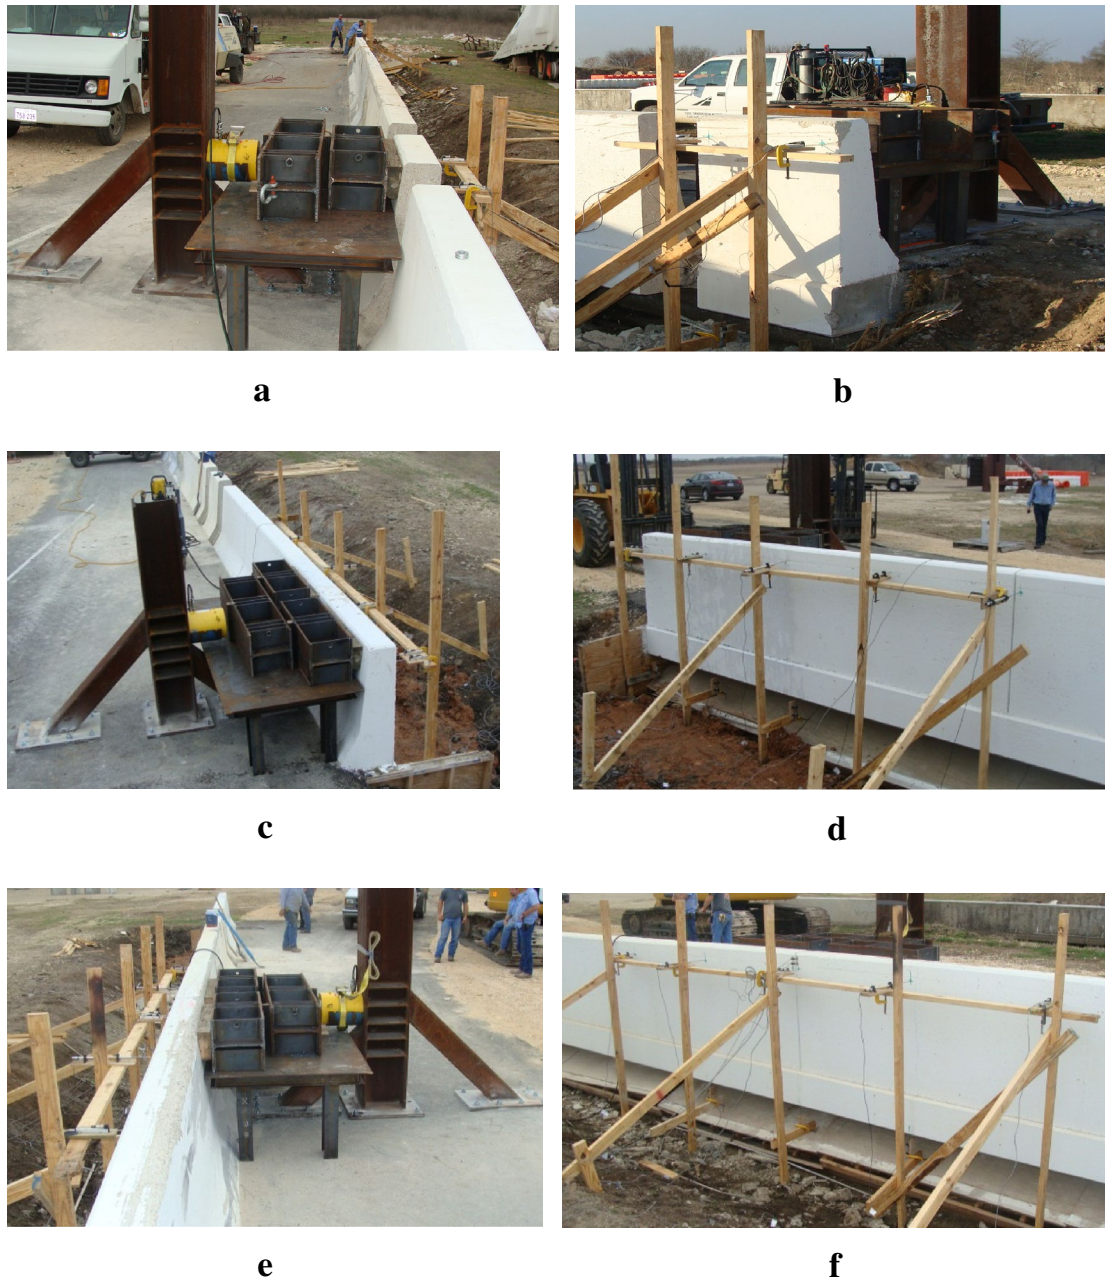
Views of the test setups for constructed barrier. a Test setup for 1000 mm length barrier wall at interior location, b test setup for 1000 mm length barrier wall at exterior location, c test setup for the barrier wall loaded over 2400 mm length at exterior location, d back side of the exterior 2400 mm loaded length showing sensor supporting frame, e test setup for the barrier wall loaded over 2400 mm length at interior location, f back side of the interior 2400 mm loaded length showing sensor supporting frame.
